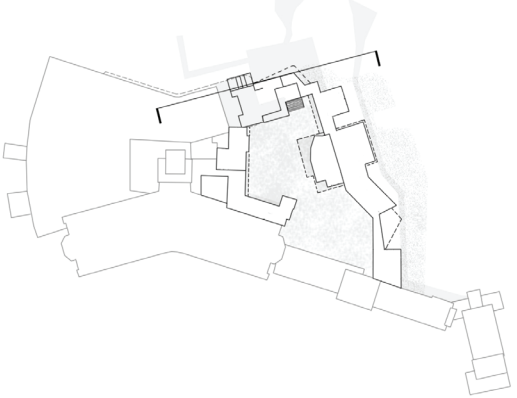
Northern elevation_Scale 1:400 (Author 2020)
